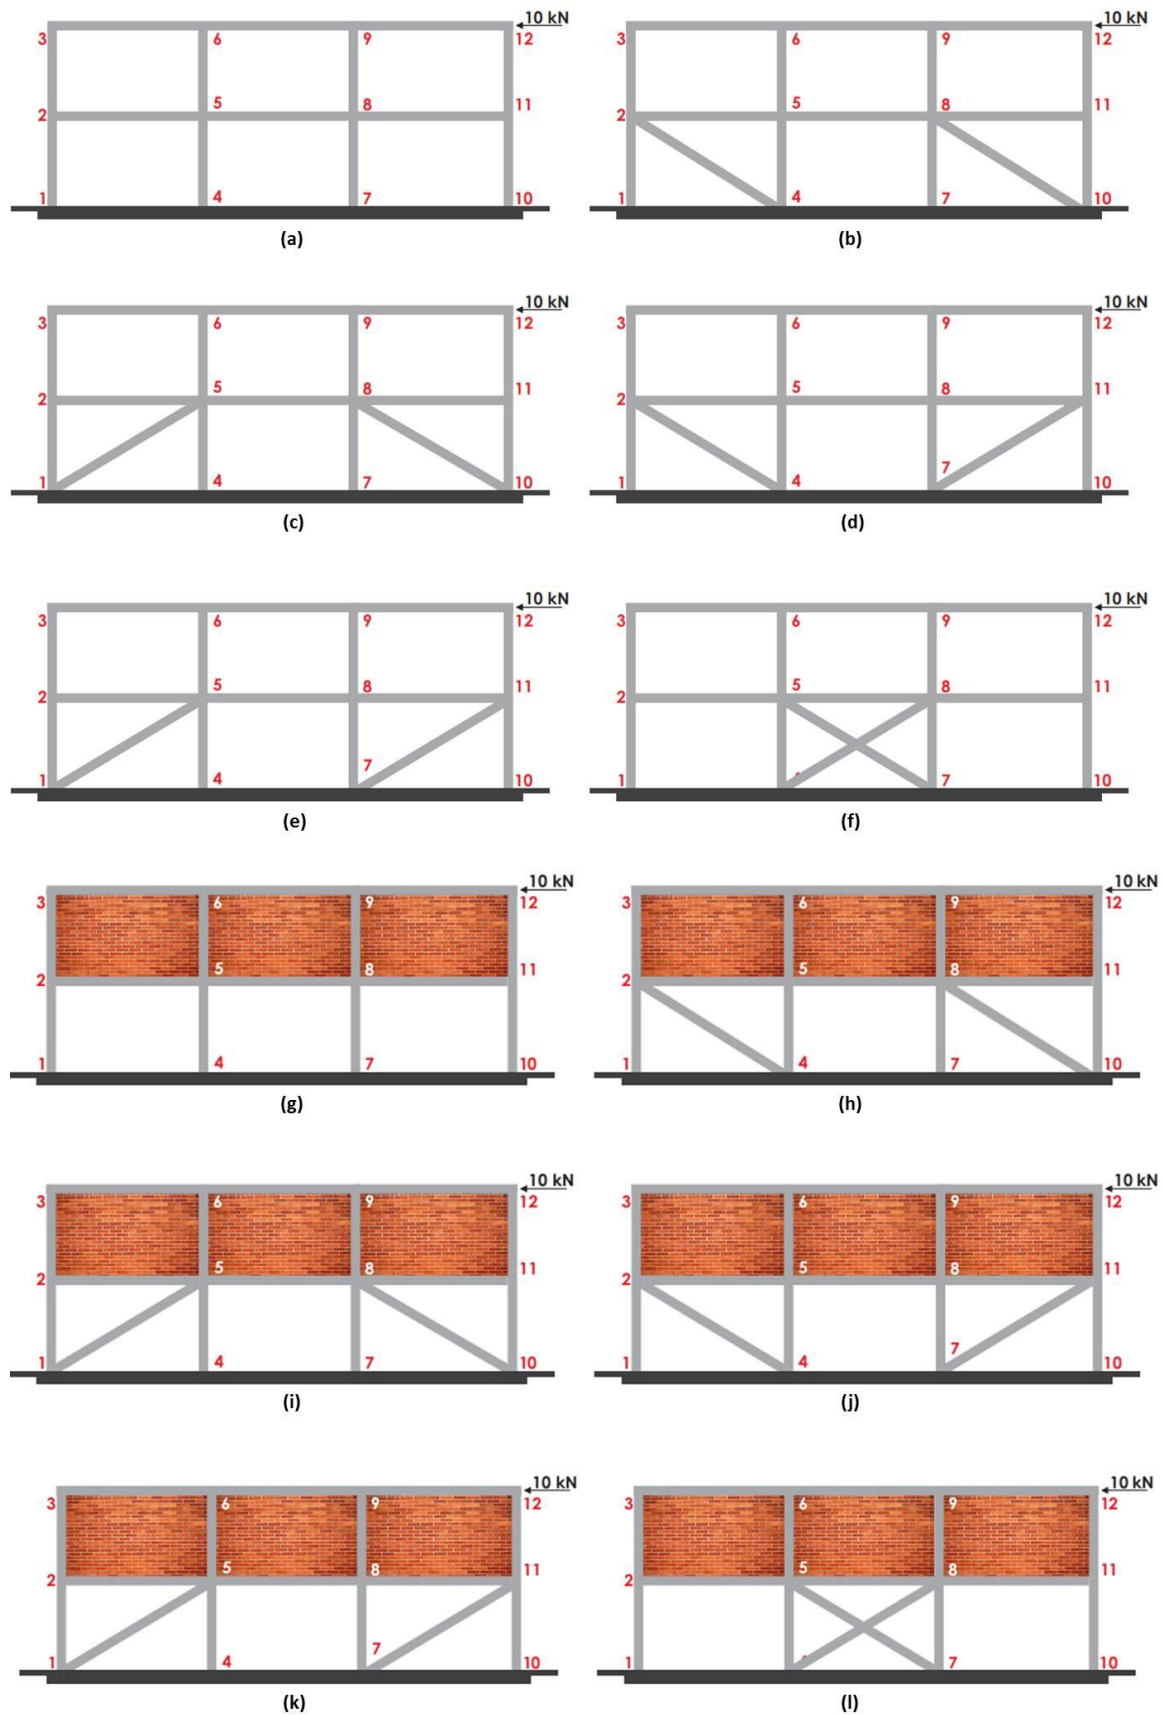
Three bay two storey (a) – (f) without infill walls with possible orientations of bracings (g)-(i) with infill walls.
